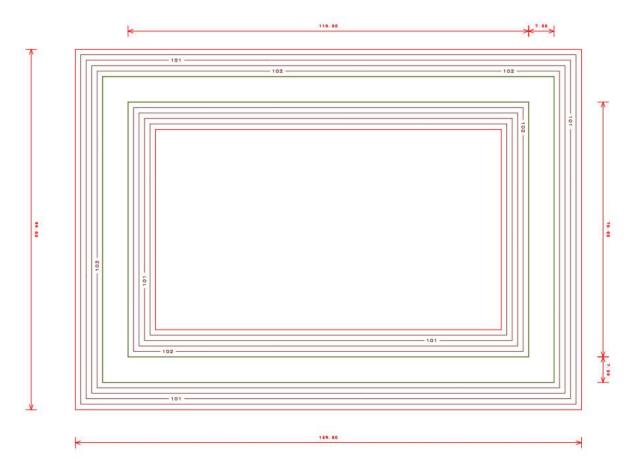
Raw water storage dam wall design. Source: Navachab, 2022
